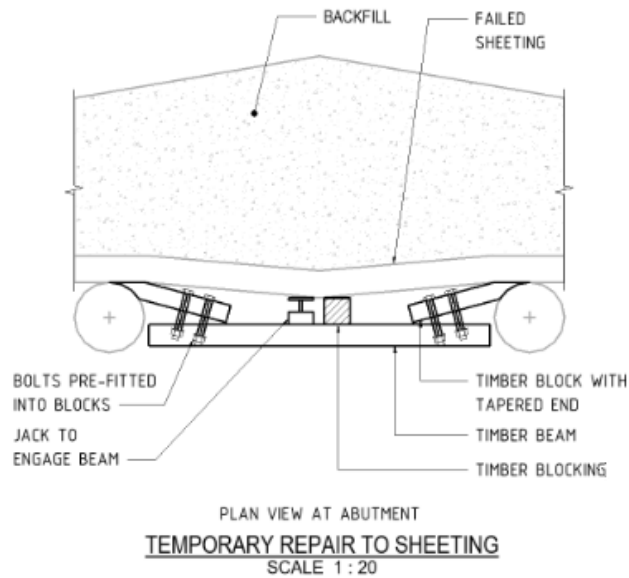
Temporary repairs to timber sheeting. (Source: 520212TP-AURC-B00390-ST-DRG-000033 and Design Report, Aurecon 2023)
